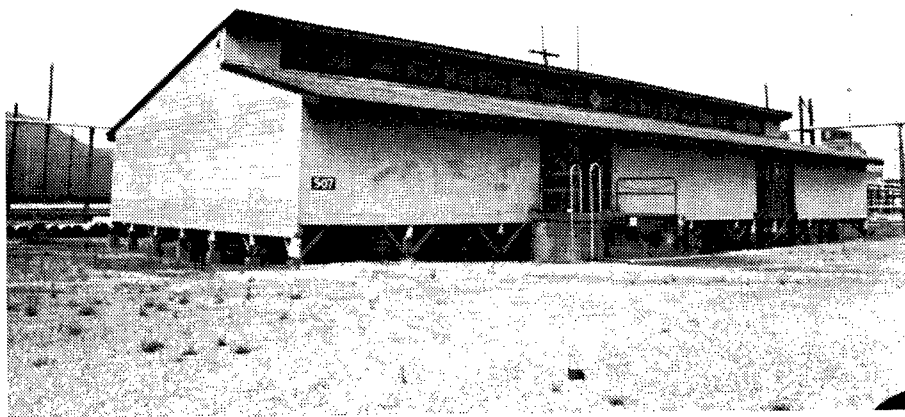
Building 507: General Purpose Warehouse and Storage Building.
